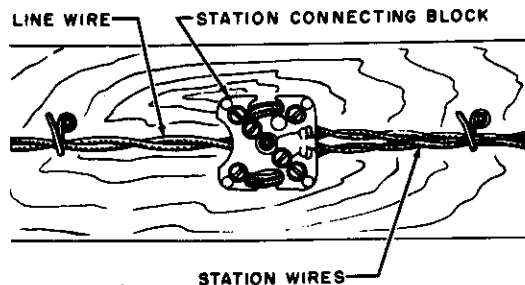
Typical Bridging Connections at Station Connecting Block
